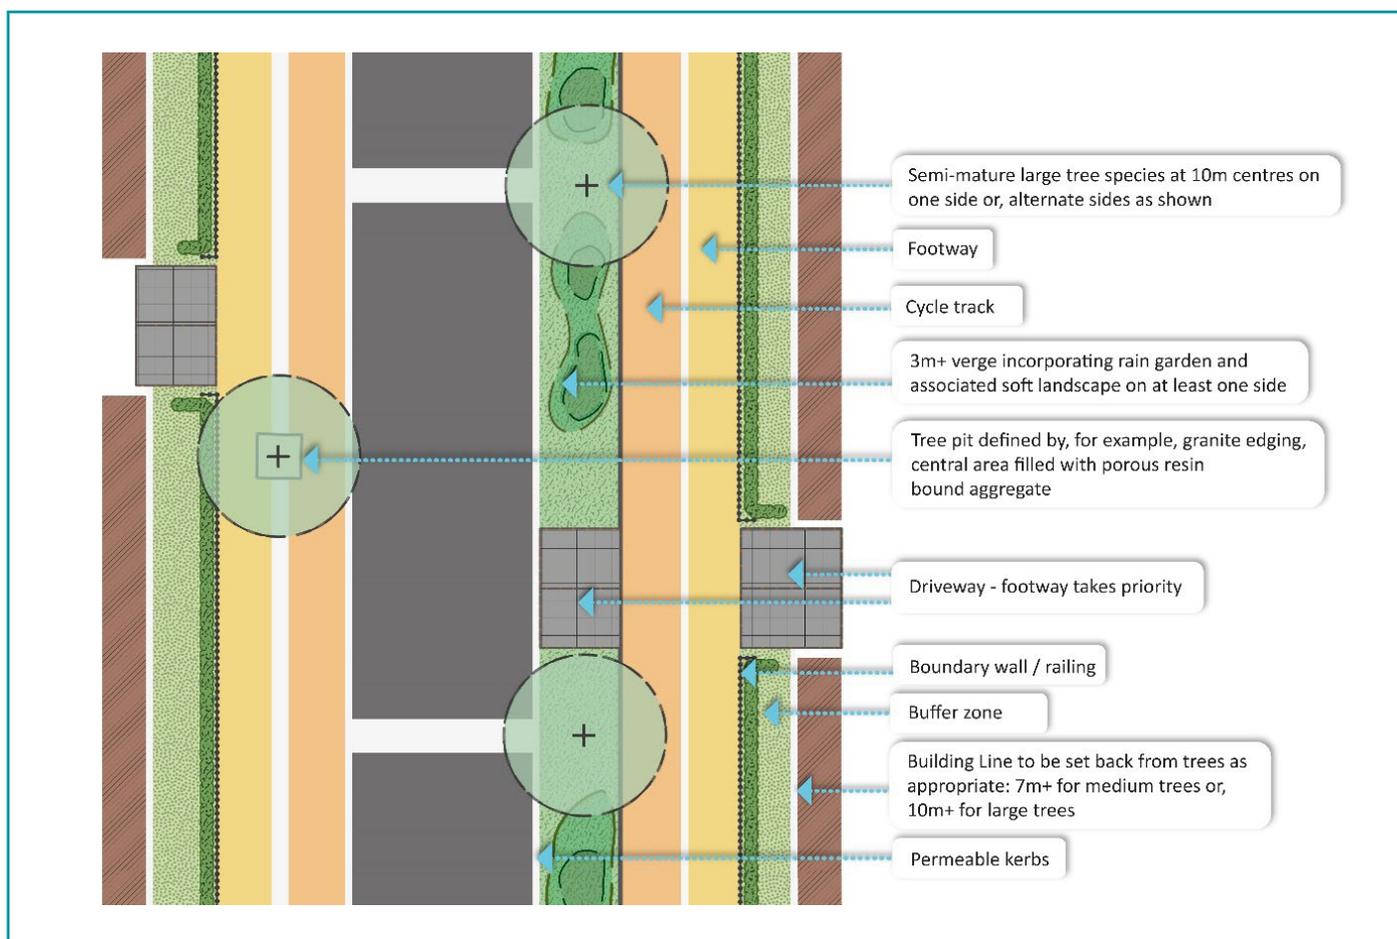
Illustration of an acceptable street tree layout on an Access Street.
